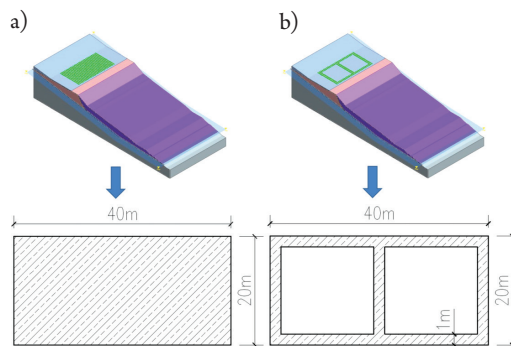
Foundation: a) on the base plate, b) on the continuous footing
